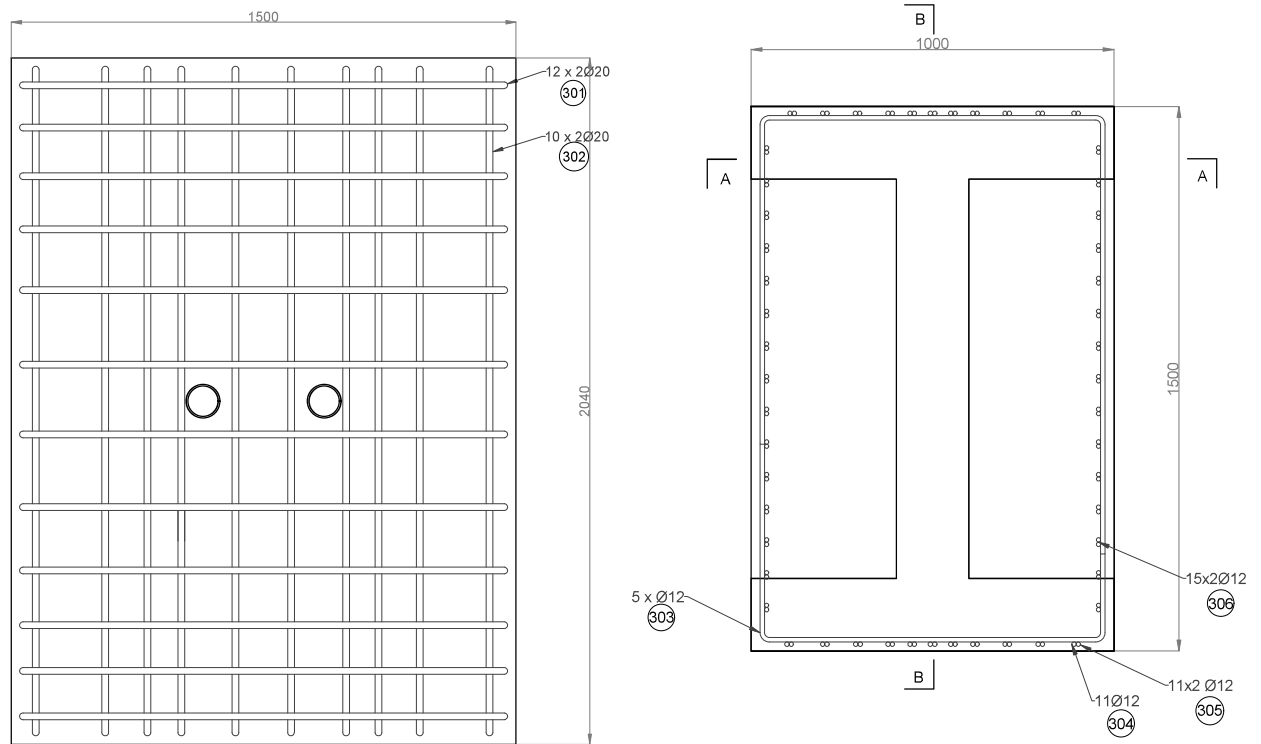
Plan view of the steel reinforcement respectively in the foundation and in the slab
